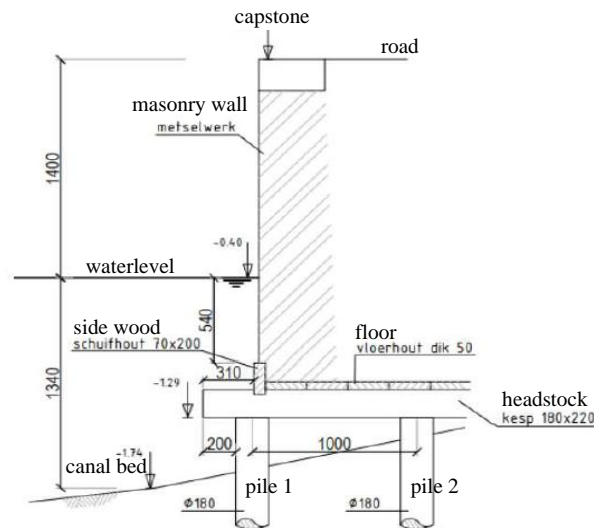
Typical cross-section of quay wall (Toetsing Amsterdamse Kademuren; Rapportage Technisch Advies Kademuur HEG0201, 2023)
